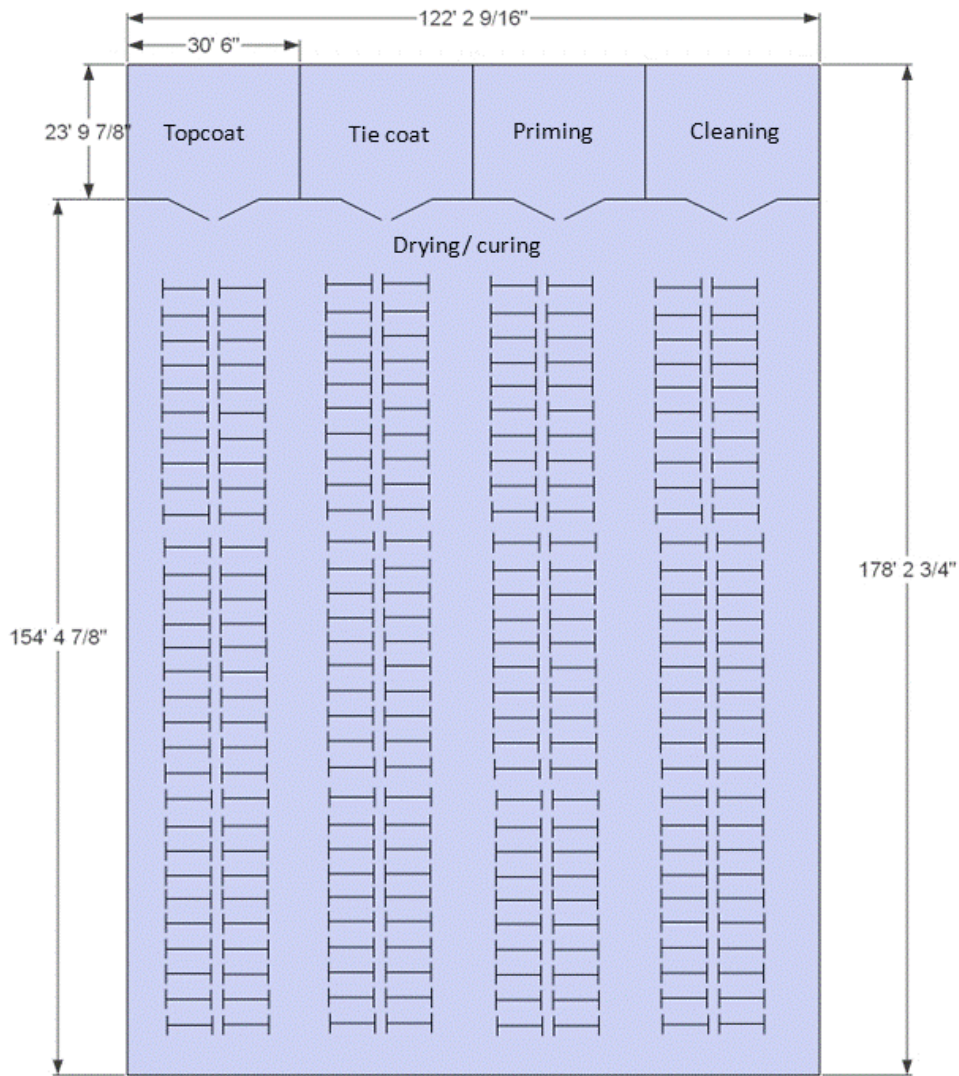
Plan view of schematic drawing of warehouse used for paint application showing the different areas for cleaning, drying and curing as well as applying the primer, tie coat and topcoat. Paint racks are shown as |---|. Paint racks will be assembled in the warehouse.
